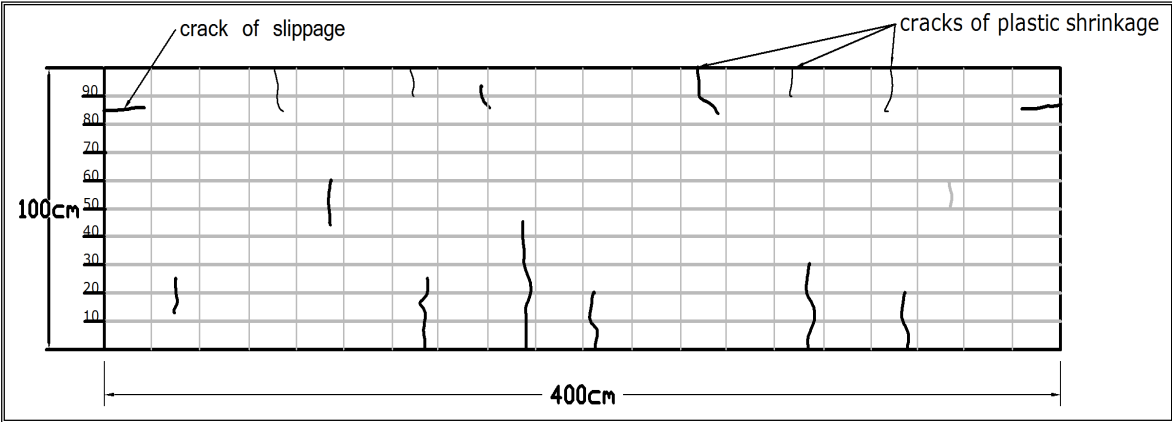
Final cracking pattern of wall (4W) after age of (90) days
